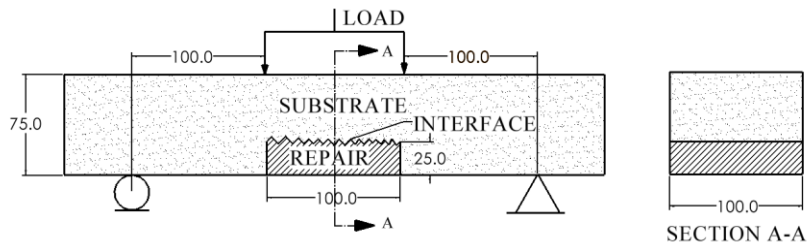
Prismatic specimens under four-point loading (all dimensions are in mm)
